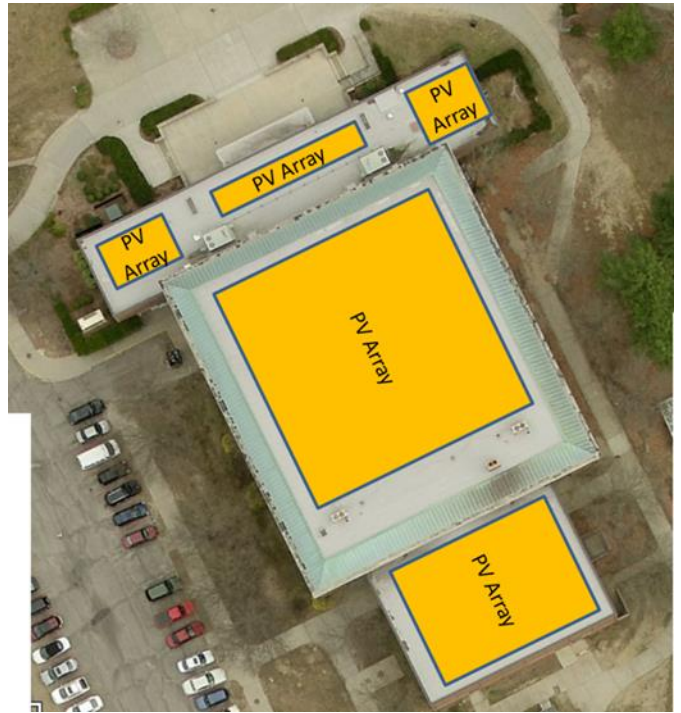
Roof of Brookhaven Gym with possible PV array arrangement.
